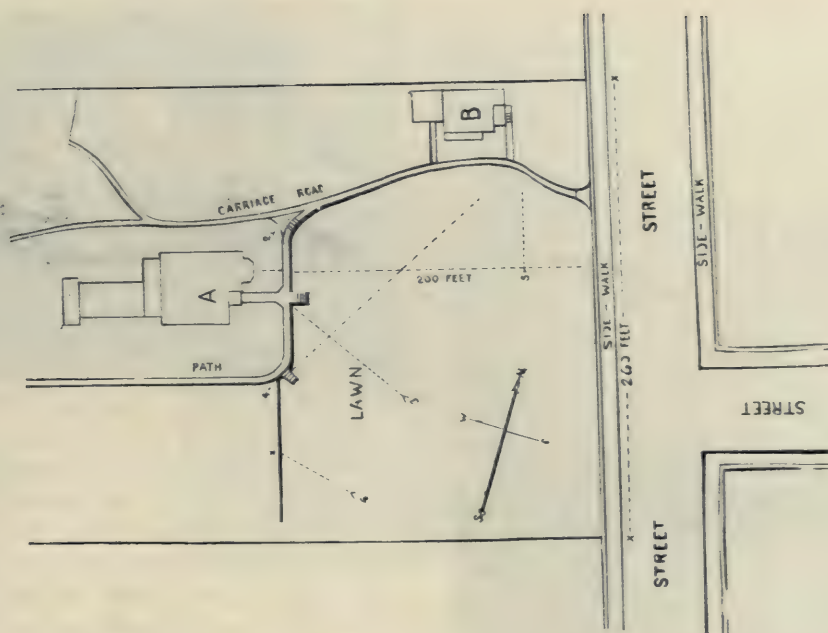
PLAN OF MR. BEALL'S GROUNDS.
